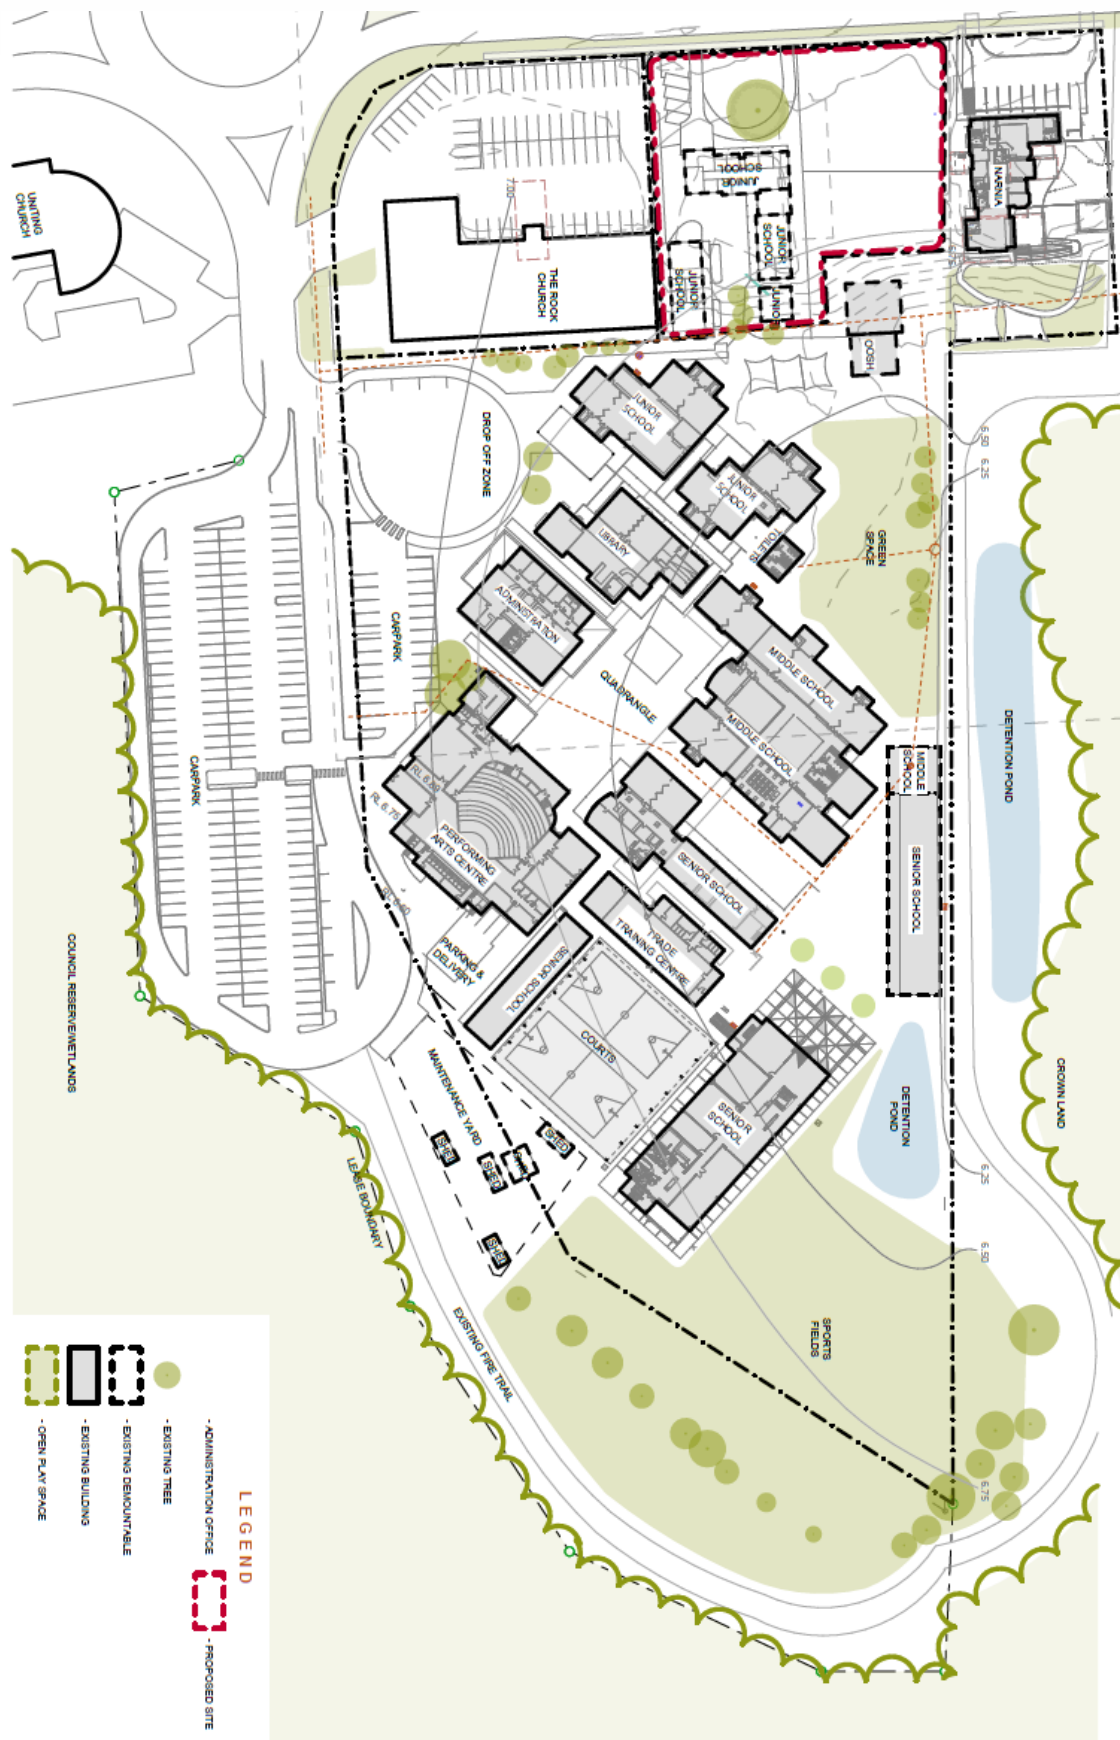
SPCC Port Stephens Educational Facility, with subject site outlined in red (SHAC 2021)
